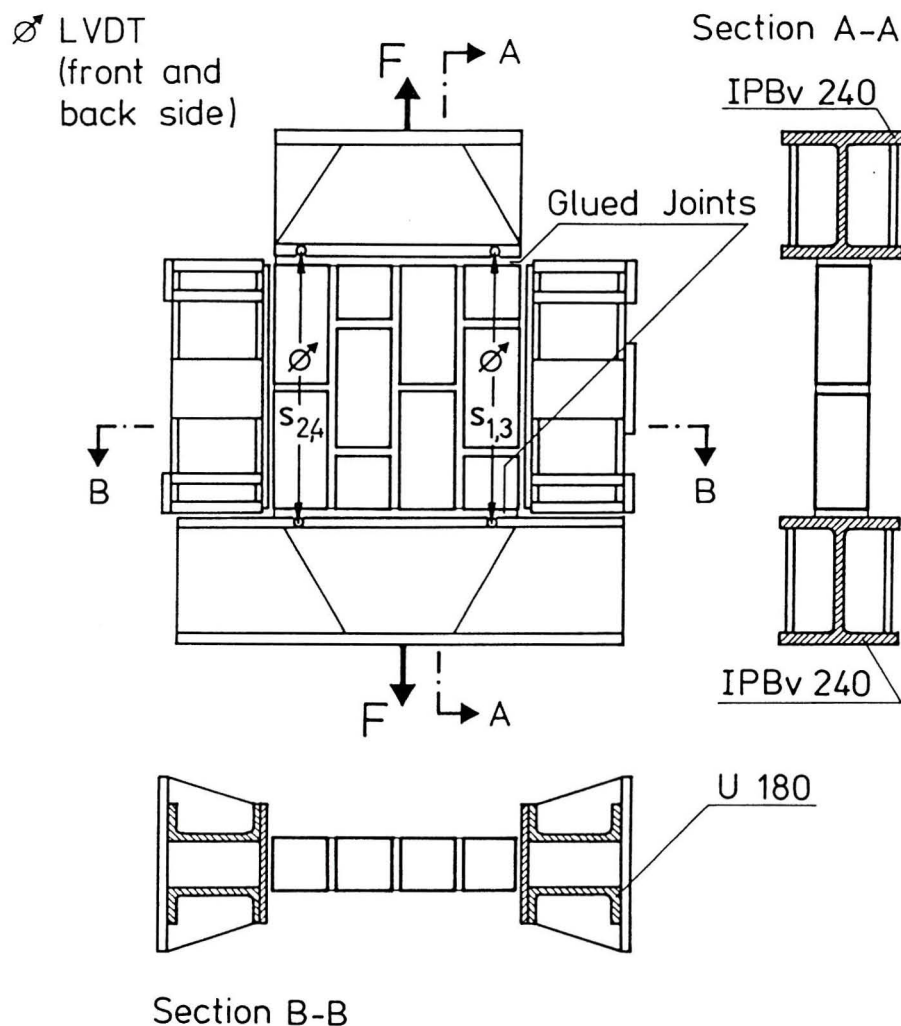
Test Set-up for Tensile Testing of Masonry Wallettes
